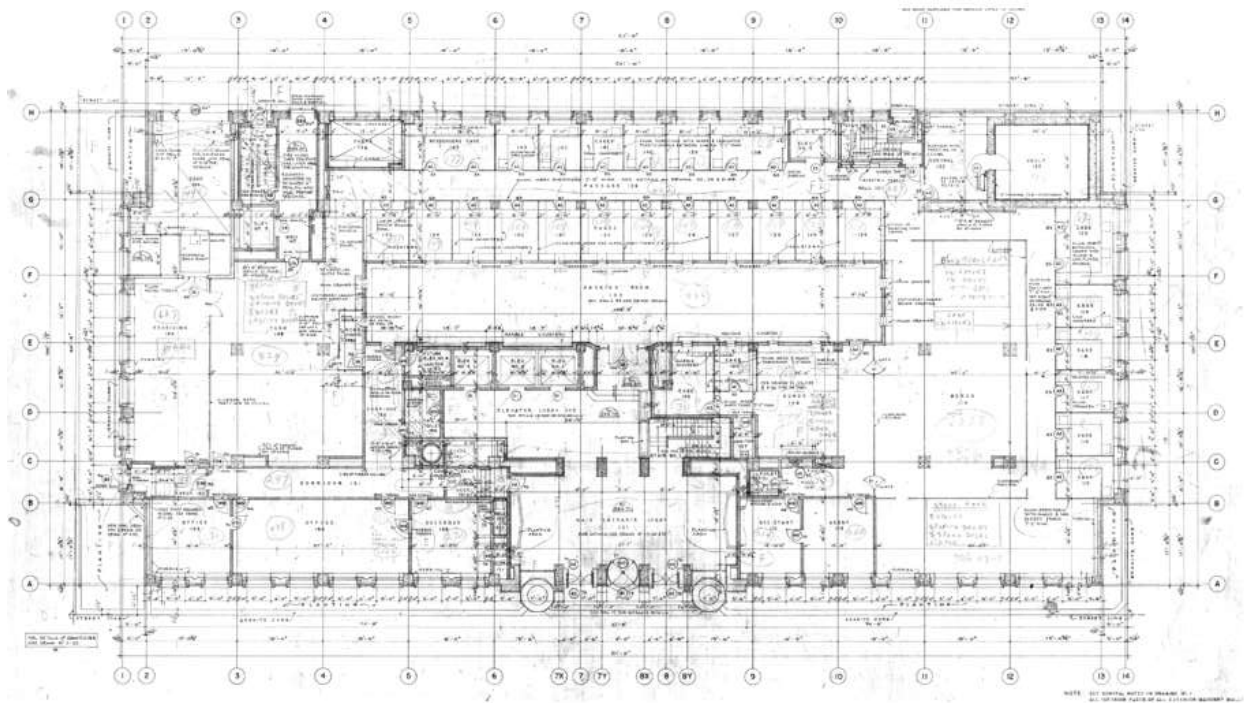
First Floor Plan for 250 University Avenue (City of Toronto Buildings Records)
